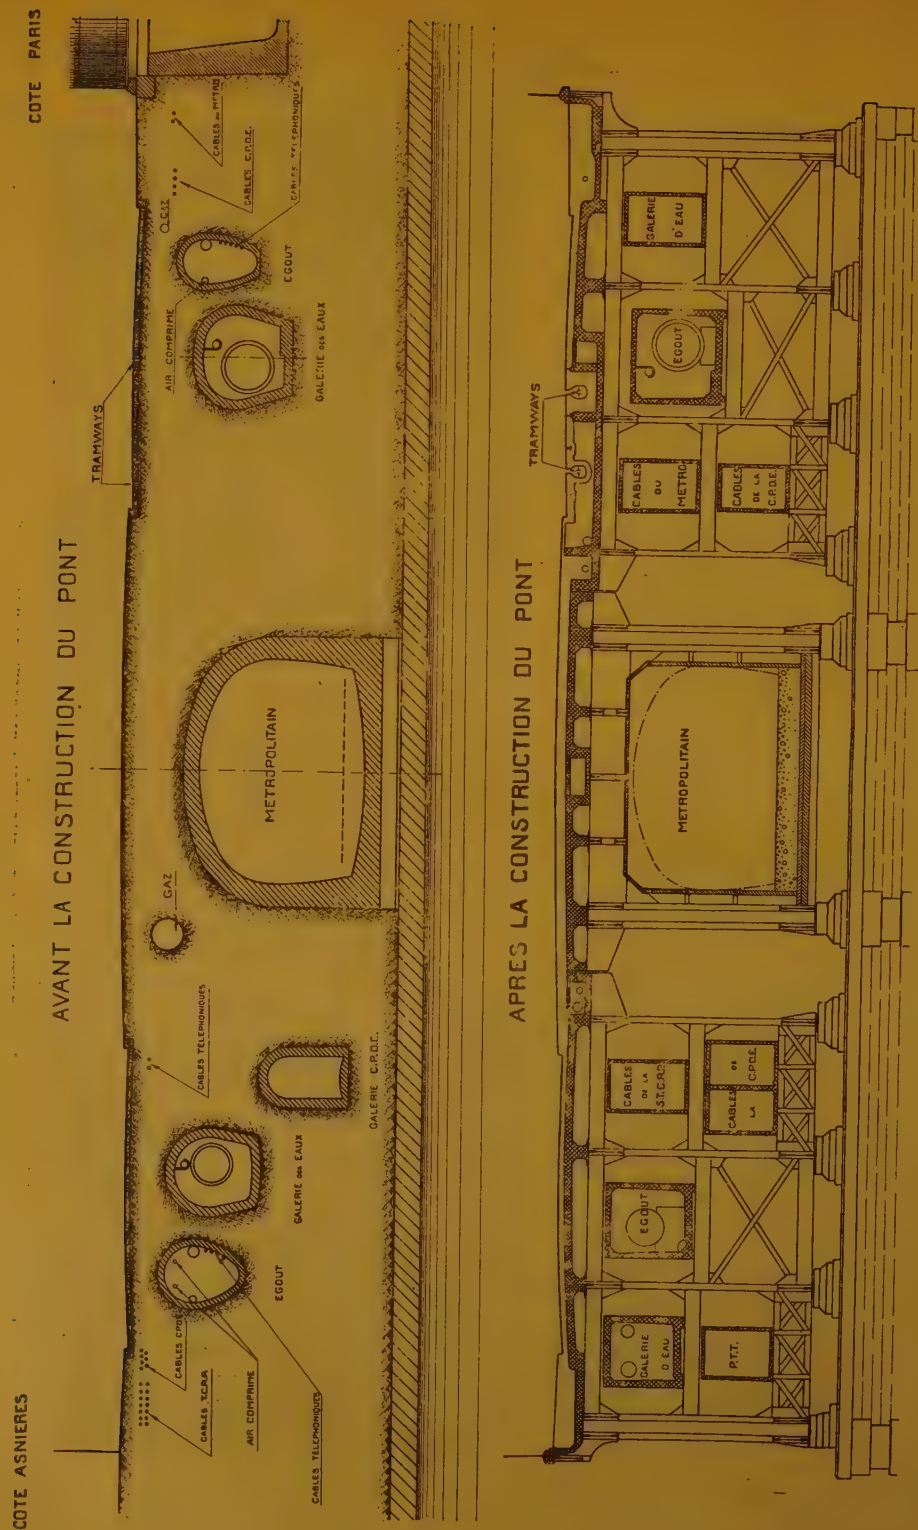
Boulevard des Baignolles bridge. — Ground before construction. — Cross section of bridge.
